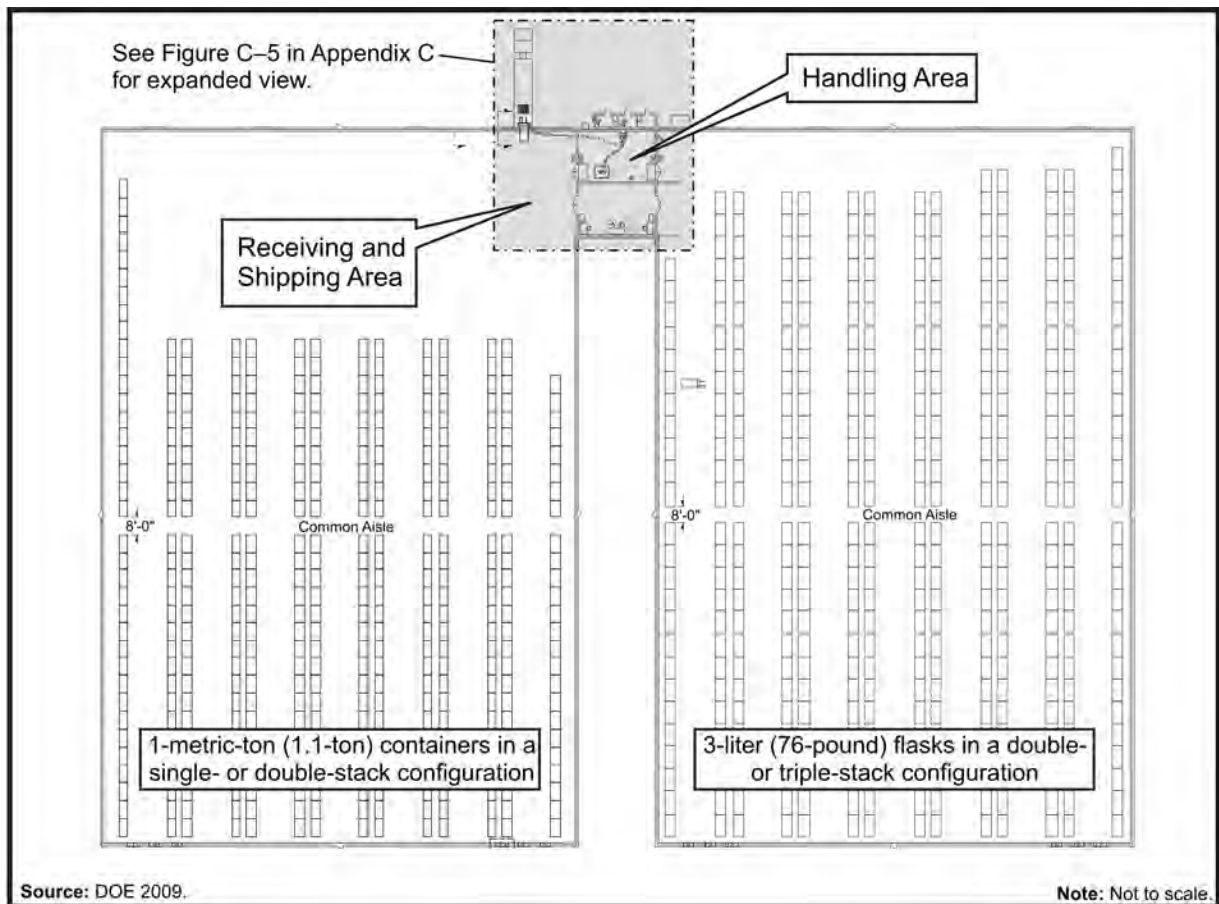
Potential Conceptual Layout of a New Mercury Storage Facility
